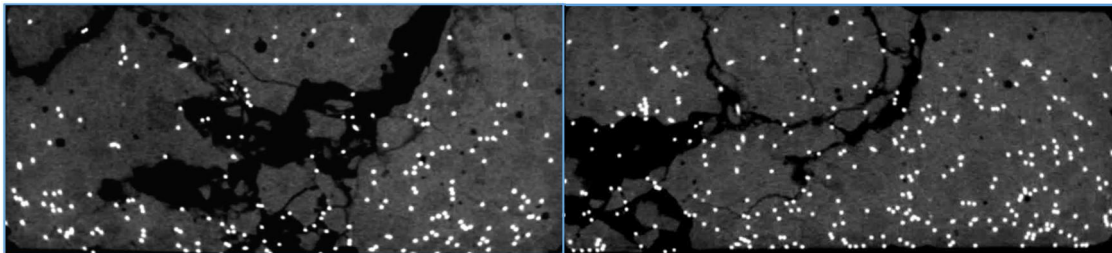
Steel fibre dispersion in crack opening location: (a) TS4 M2; and (b) TS4 M3.
